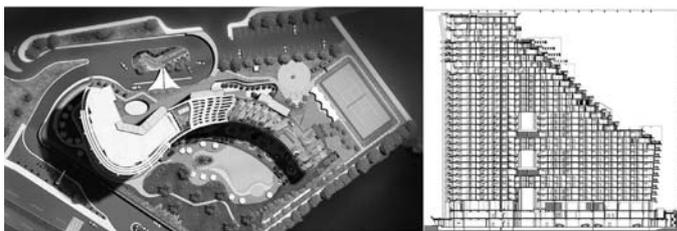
The image of Ottomare Suites, site plan and section drawing.
